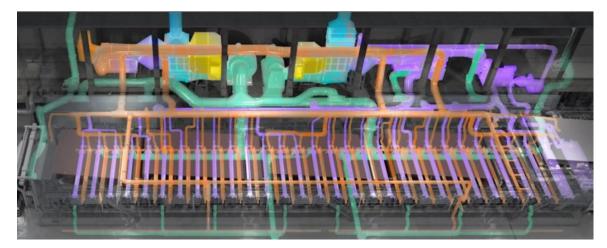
Ventilation ductworks of pre-drying section (Valmet Technologies 2024c.)
